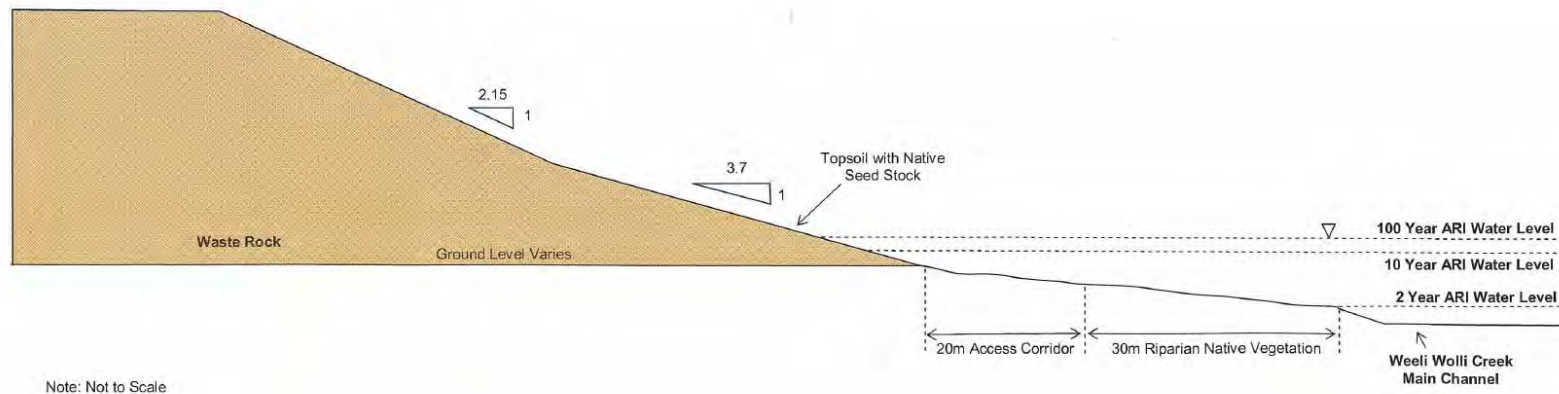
Cross Section of Waste Rock Disposal to Weeli Wolli Creek
